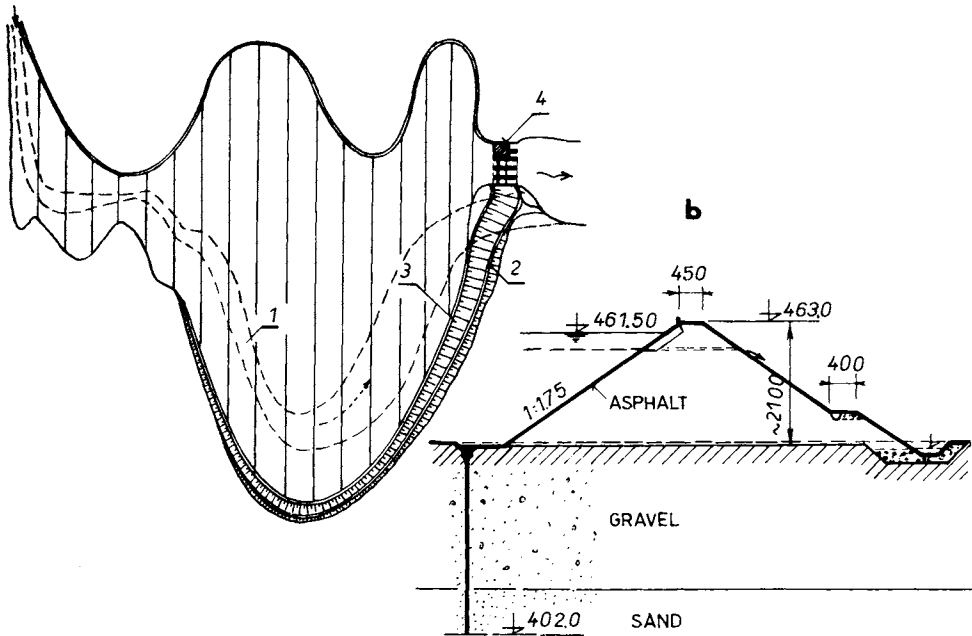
Antiseepage measures on the earth dam Freistriz. a — lay-out, b — cross-section; 1 — river-bed, 2 — earth dam, 3 — cut-off wall, 4 — power-house.
